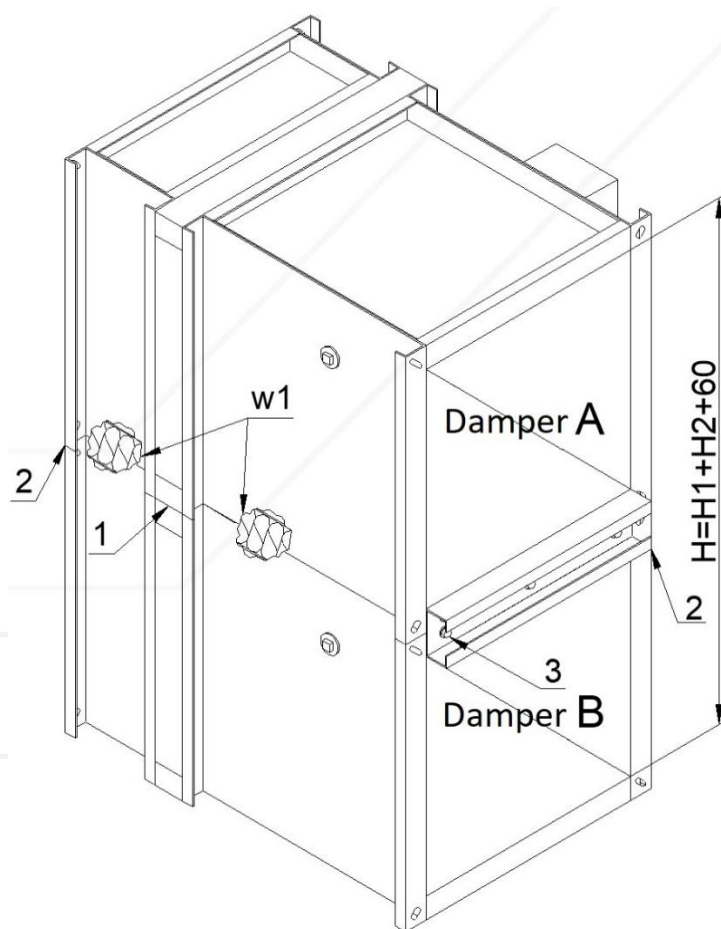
Arrangement 1 - vertical battery consisting of two smoke control dampers KWP
